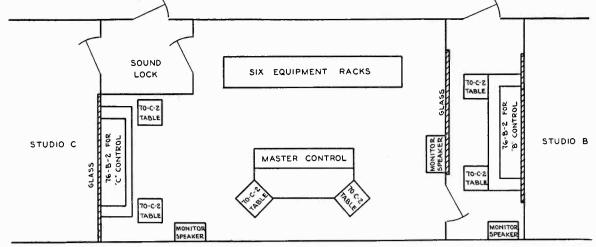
Floor layout of the WBAL master control room and Studio B control room.
